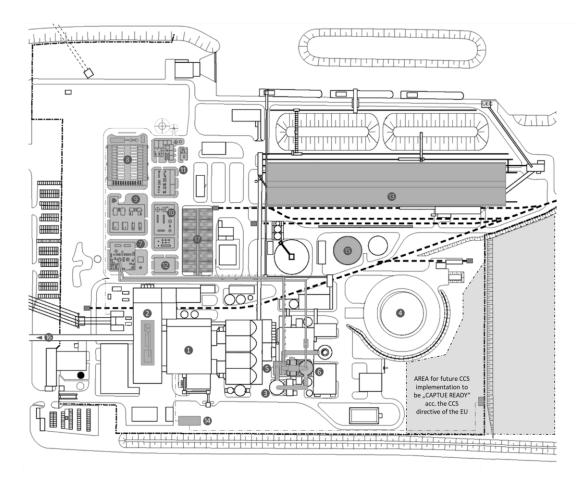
Layout of the retrofitted site of the CHP power plant
